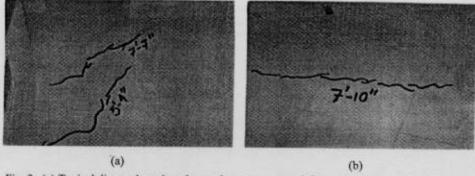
(a) Typical diagonal crack at the north-east corner and (b) typical horizontal crack at the north side of the slab in the fourth floor of the building
